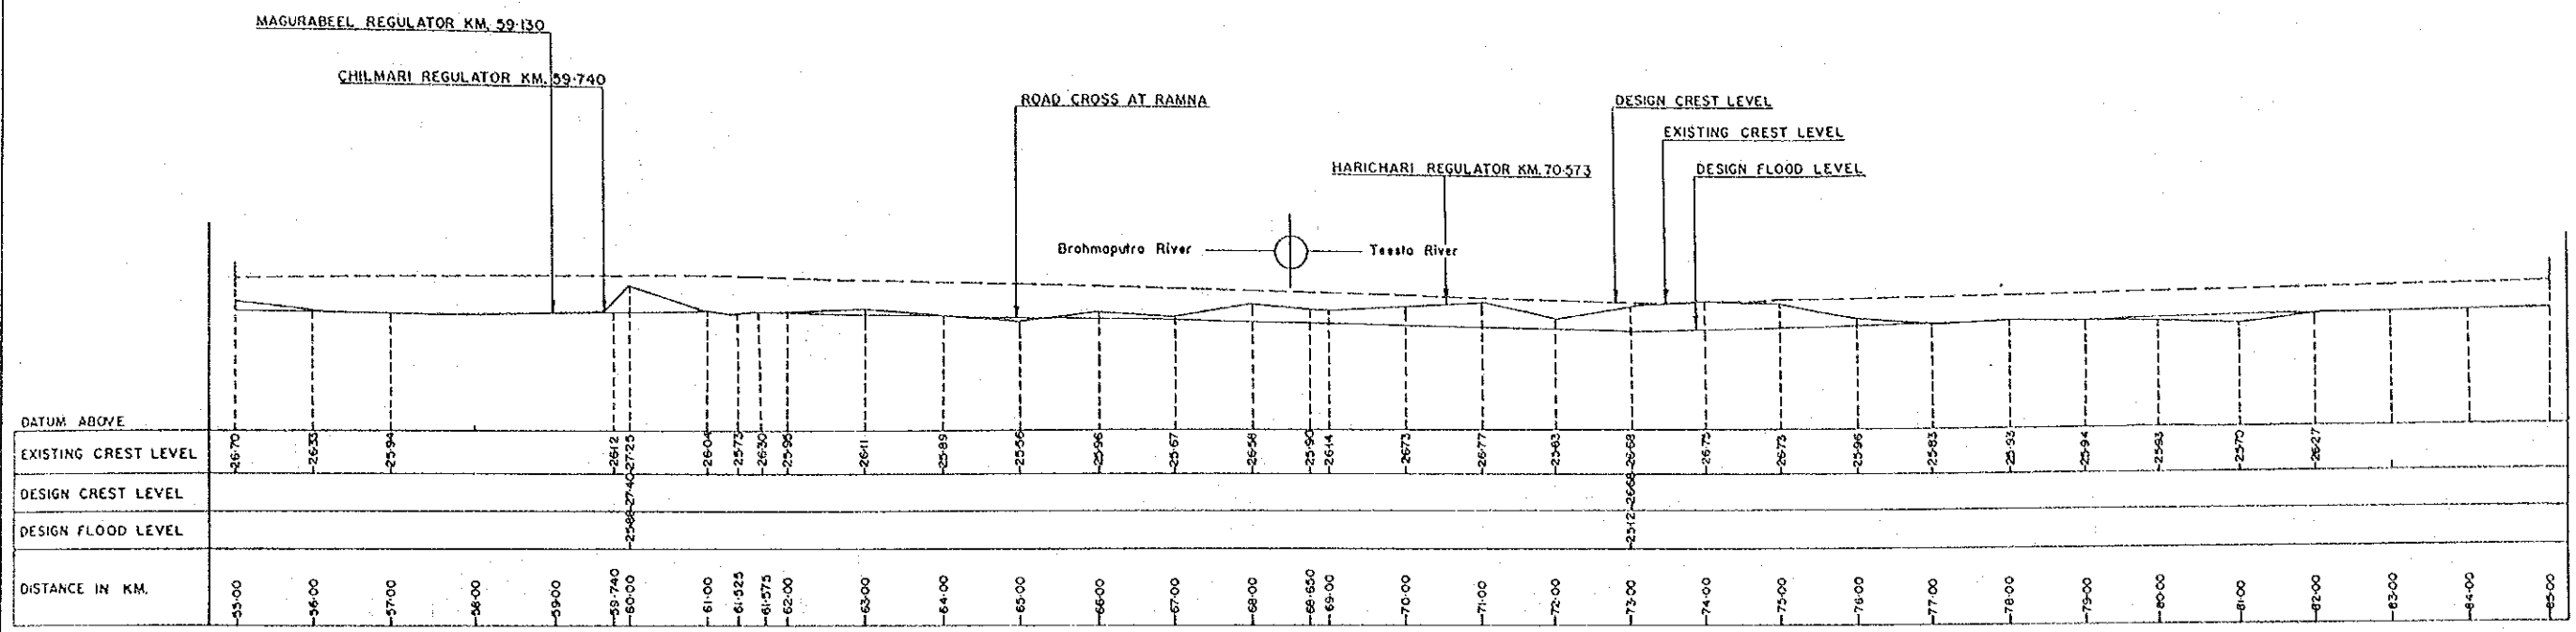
(2/2) TYPICAL CROSS SECTION OF EXISTING FLOOD PROTECTION EMBANKMENTS
